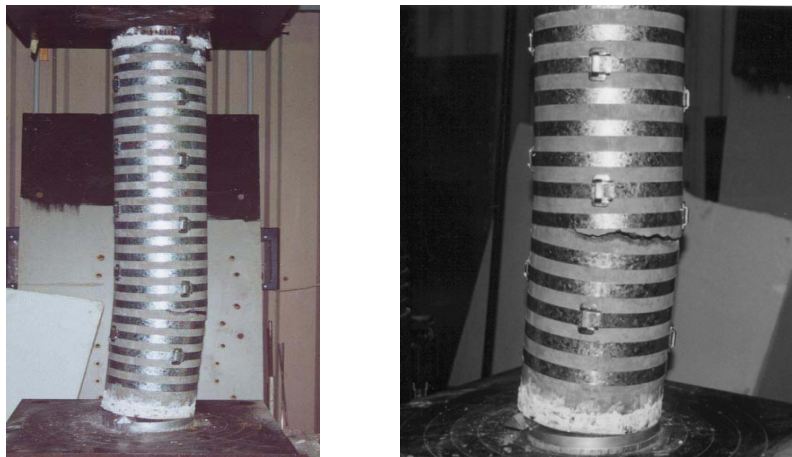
Failure of the steel strapped column with 20 mm spacing
